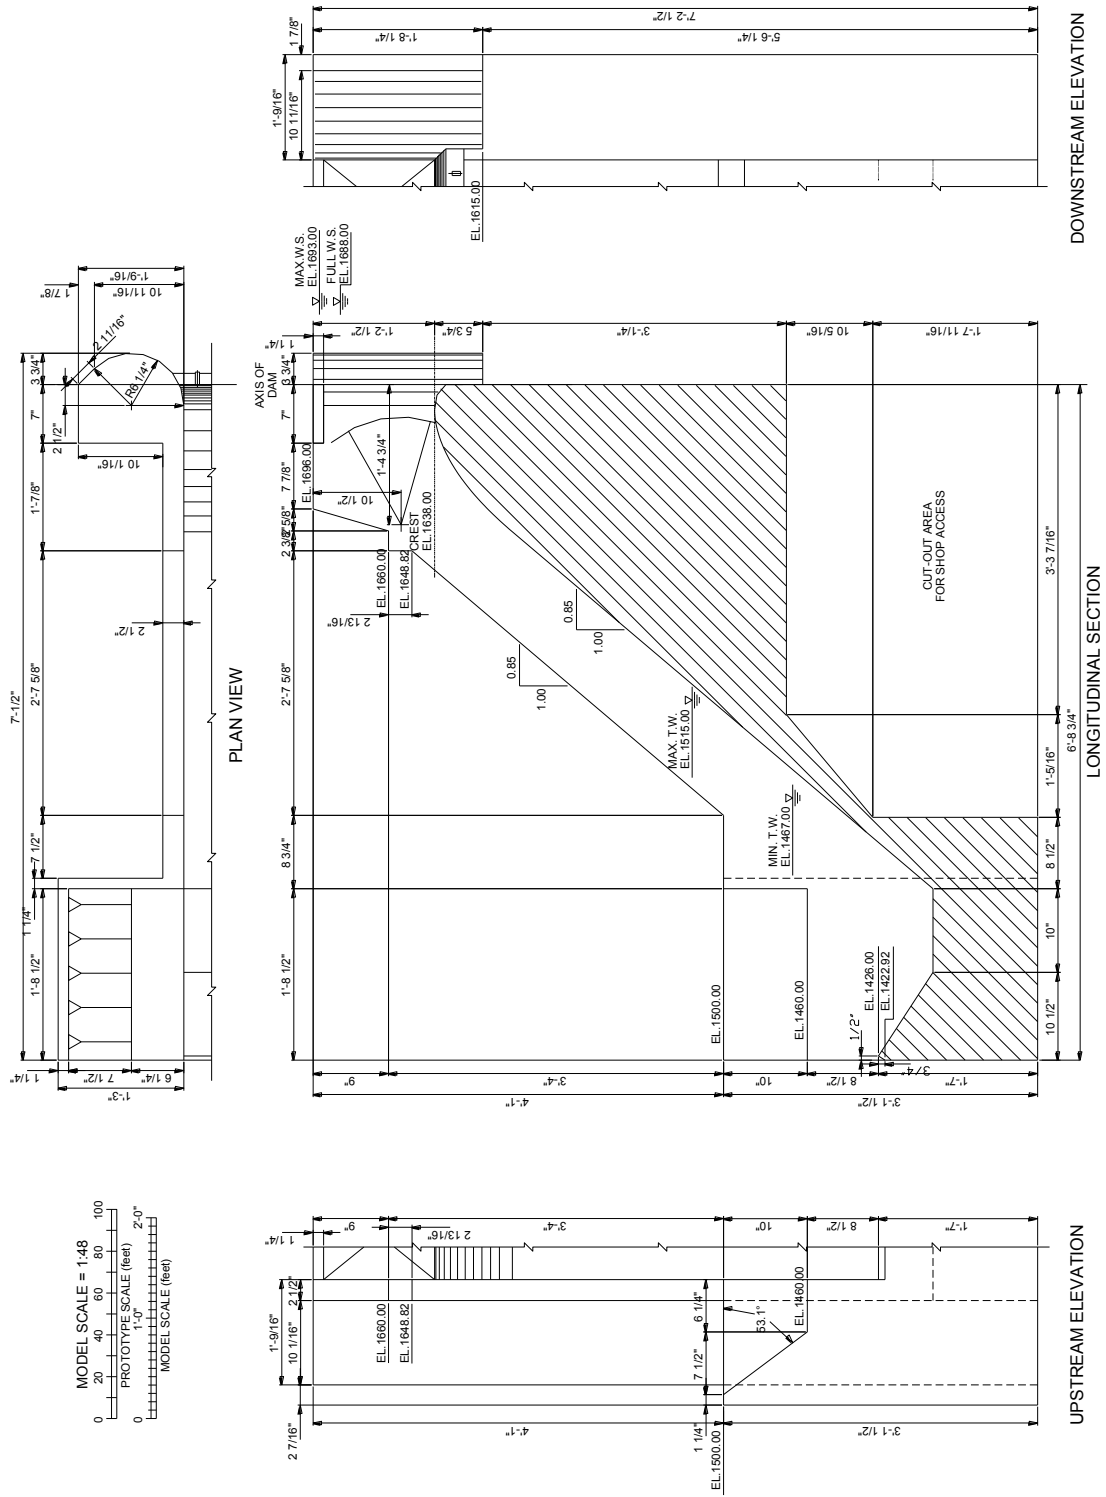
Plan, Elevation, and Section of Right Guide Wall for 1:48 Sectional Model
